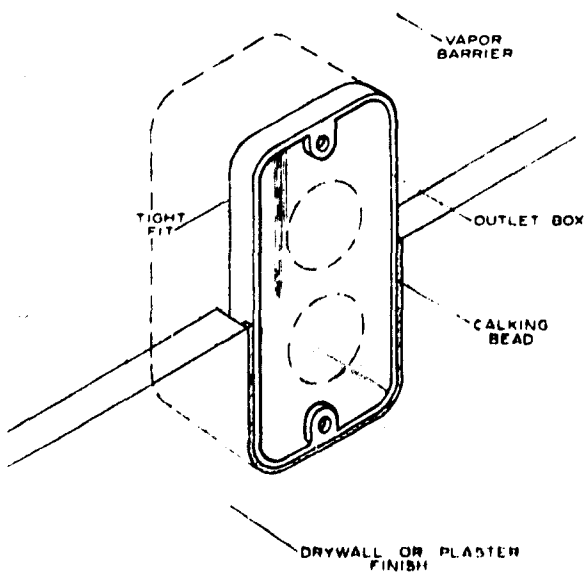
Protection around outlet boxes in exposed walls. M 139 224
